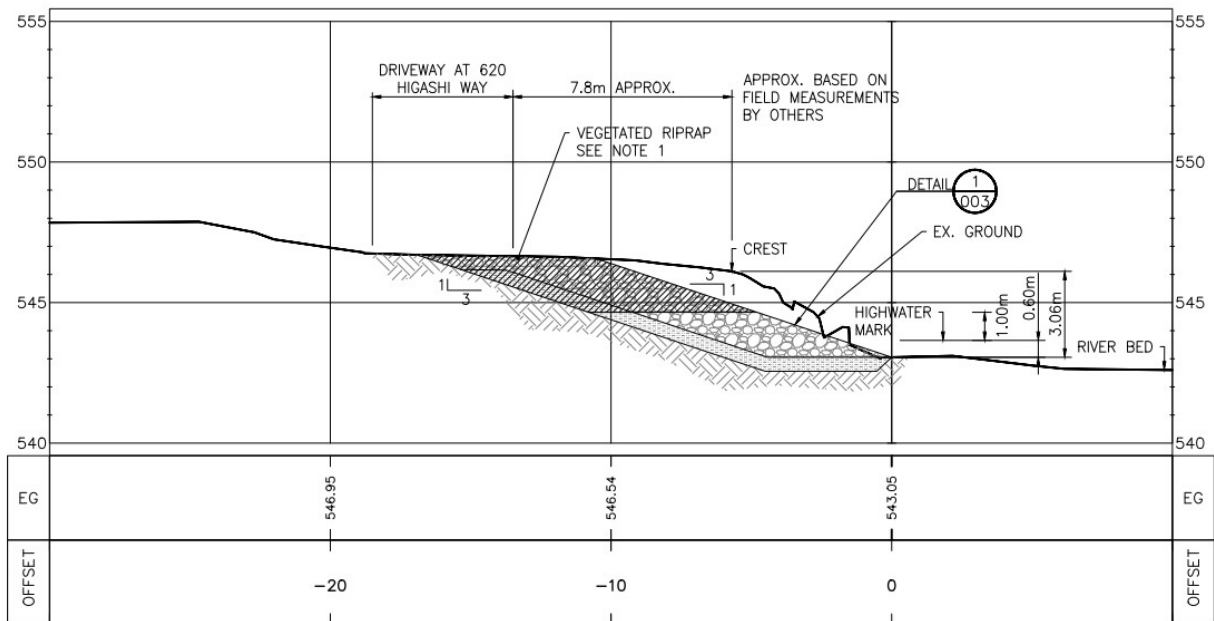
Bank stabilisation design for Kaslo River in Lot A, 620 Higashi Way. View looking downstream.
